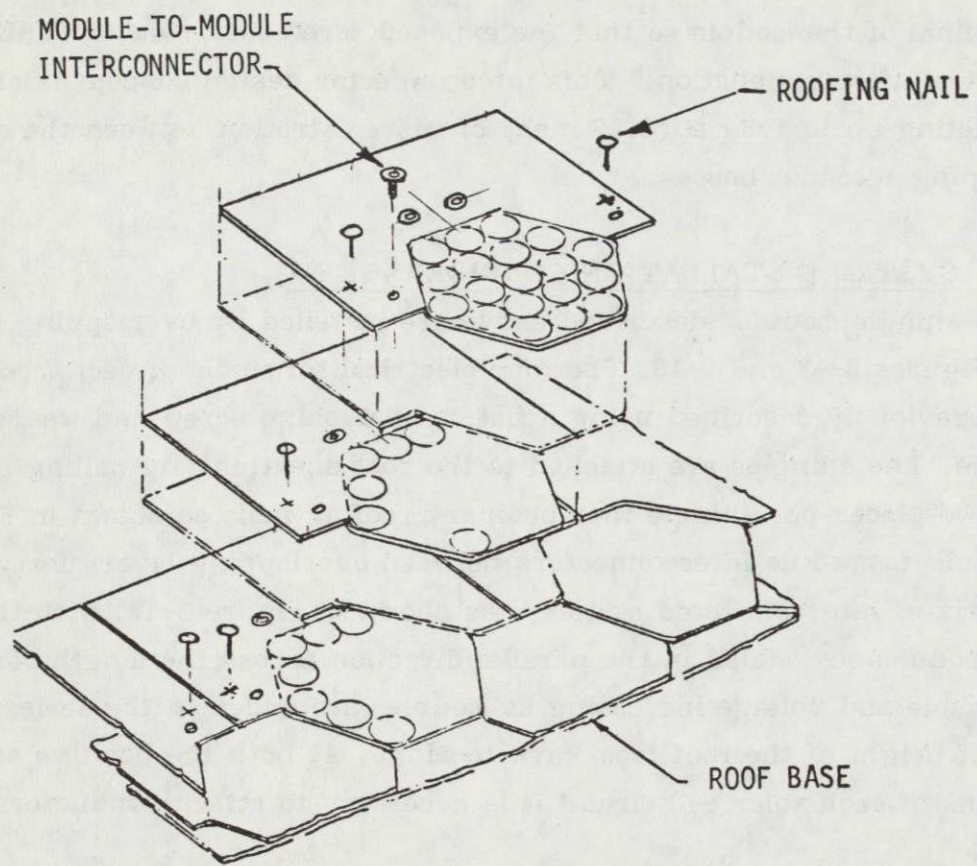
Exploded View of Shingle Module Installation on Roof
